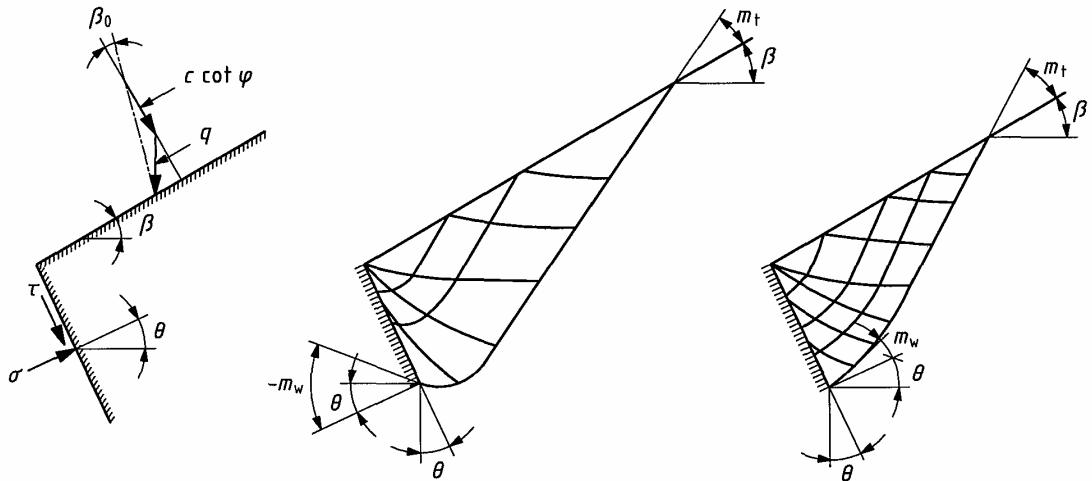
Definitions concerning wall and backfill inclination, surcharges and slipline geometry
